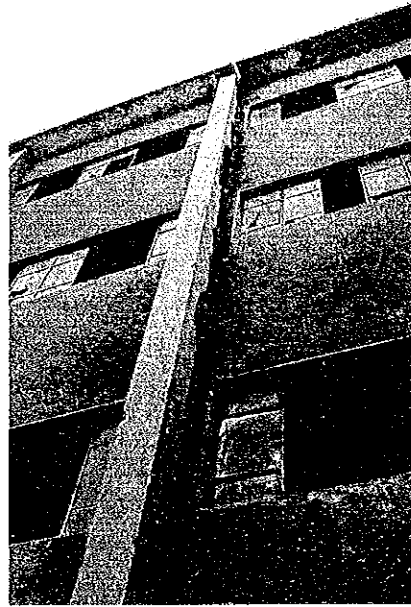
School building damaged by the collision of buildings (2/2)
